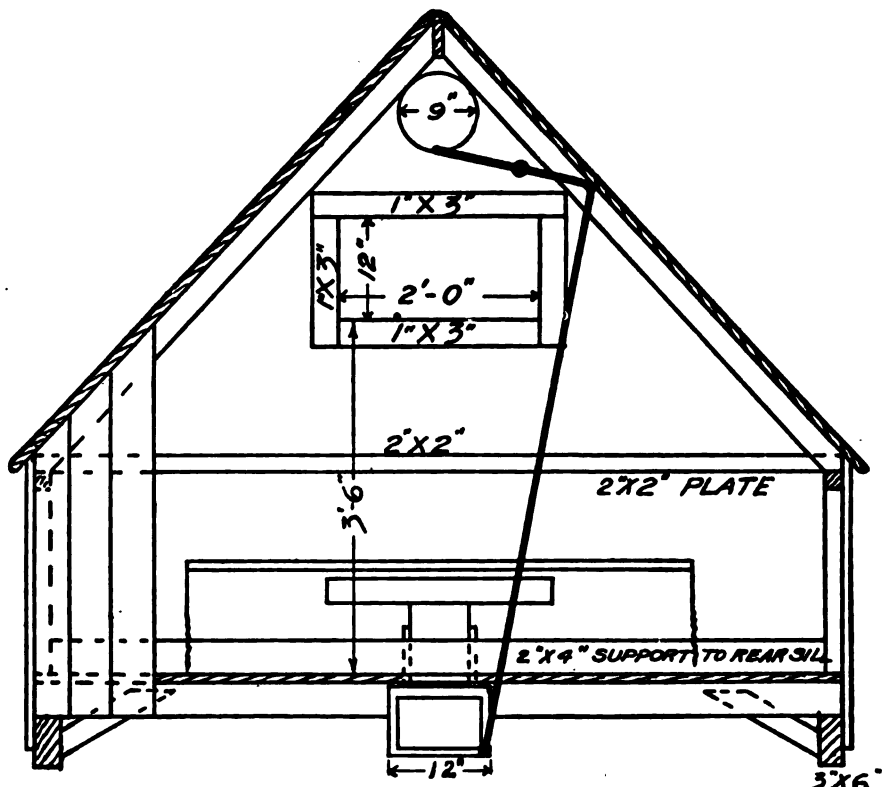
Rear elevation of the colony brooder-house. Note the position of the heating equipment and the hover
